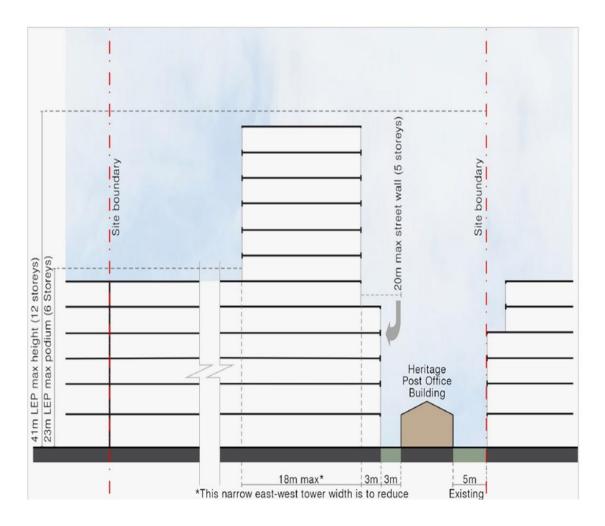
Amalgamated Site 3 - Typical East-West Section
